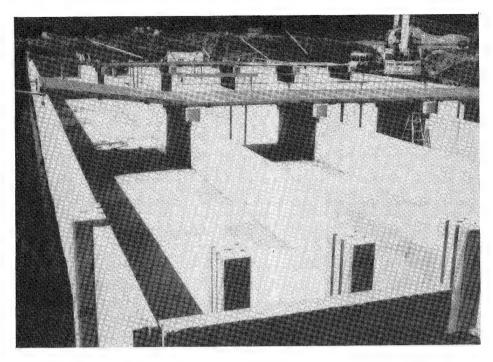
Smelt raceways at Southern Ocean Salmon. The walls are precast concrete tilt slabs (from Concrete Construction 1994)
